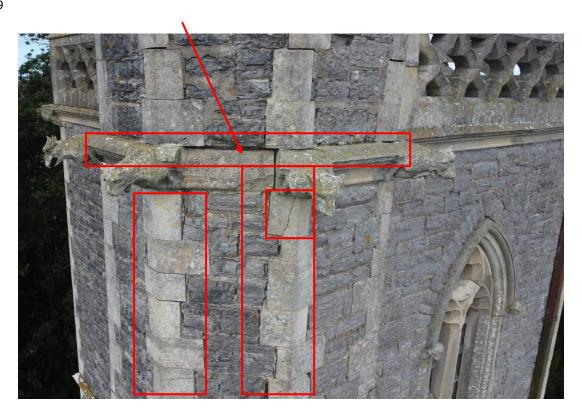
DJI_0236 Rusting Ring Beam, Fracture & Open Joints in Stair Turret South East Elevation
